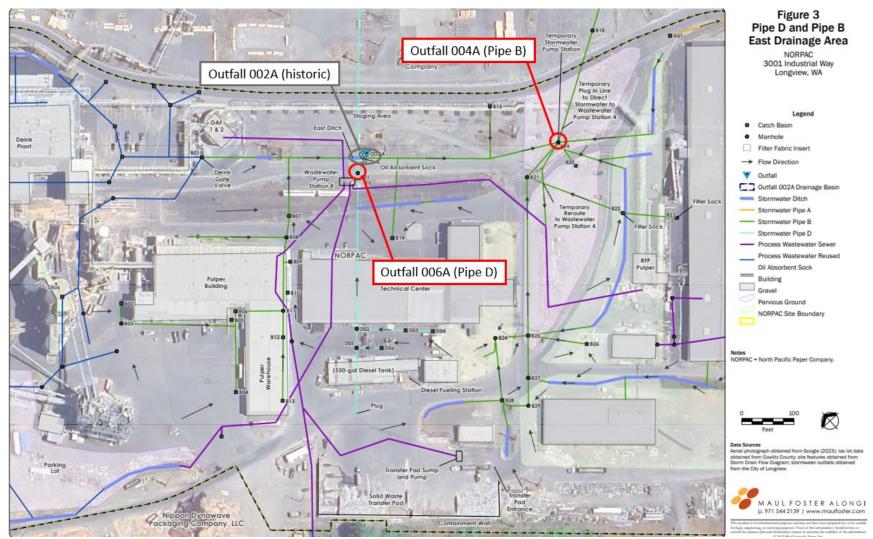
Pipe D drainage basin and portions of the Pipe B drainage basin with approximate locations of proposed Outfalls 004A and 006A and historic Outfall 002A.
